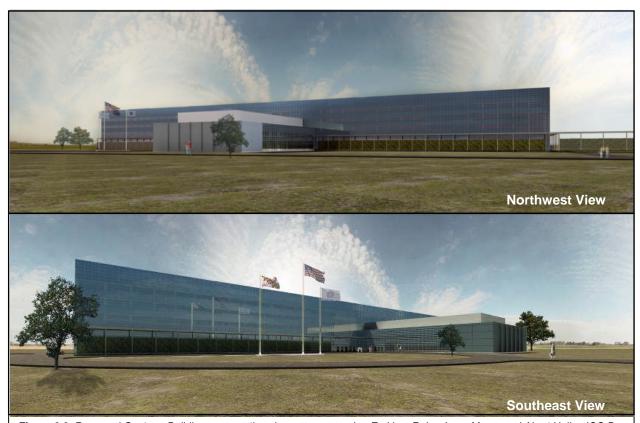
Proposed Centrum Building, perspective views encompassing Erskine, Roberdeau, Maury and Abert Halls., ICC-B Development Plan, (February 2011 Concept Plan). Use of glass curtain walls will enable improved use of natural light, reduce HVAC loads and enable reuse of existing building envelopes; sustainable building practices that will integrate well with ongoing facility operations and LEED criteria. (Site landscaping has been omitted to enhance building clarity in site perspectives).
